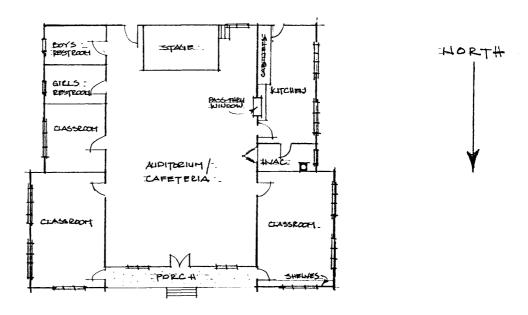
The floor plan of the historic Hurricane Mills School (not to scale).
